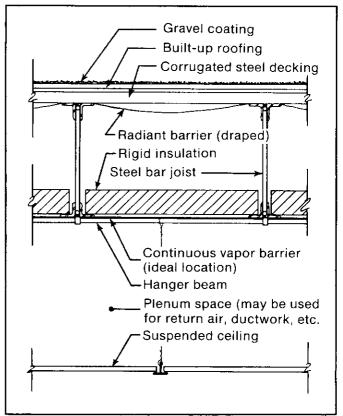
Detail of Ideal Radiant Barrier Construction for Typical Flat-Roof Commercial Building
